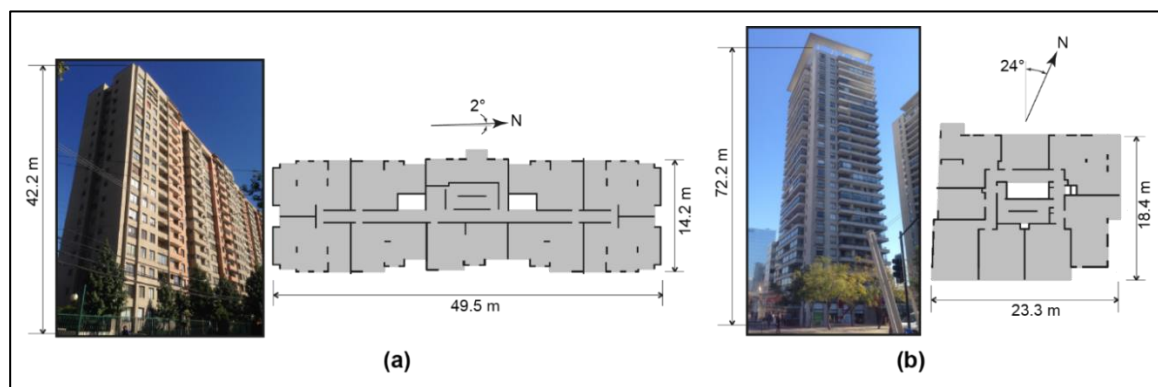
Picture and plan view of typical story for: (a) the 17-story building; and (b) the 26-story building
